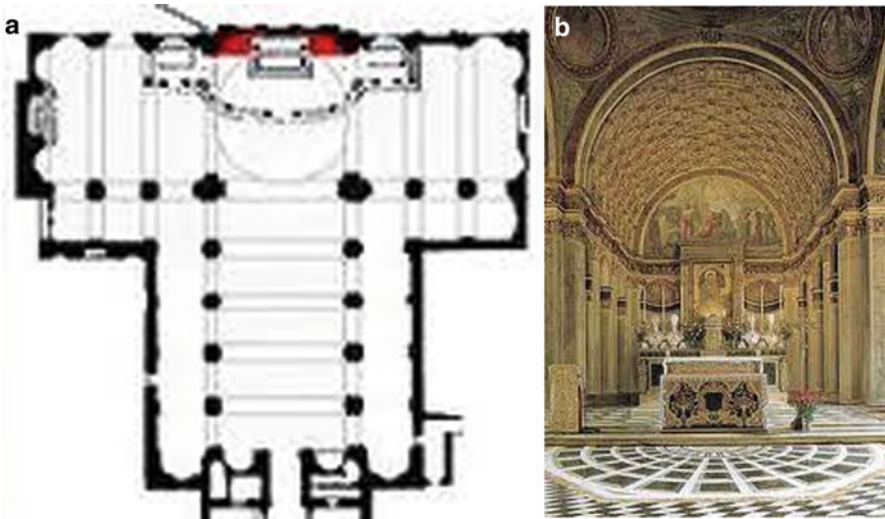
(a) The plan of the church of St. Satiro in Milan. (b) The back wall of the church of St. Satiro in Milan
